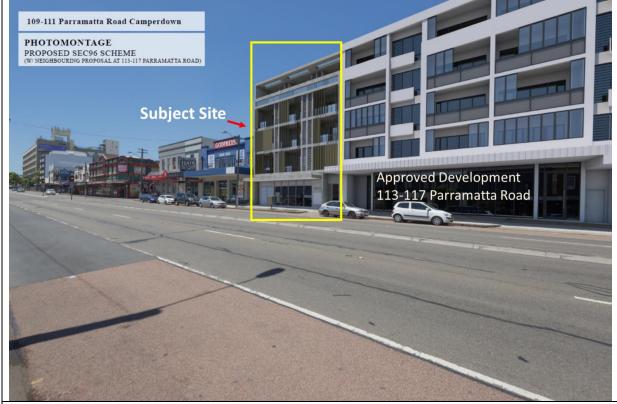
Photomontage showing the relationship of the proposed modified development on the site against the approved development on the adjoining site to the west, 113-117 Parramatta Road.
